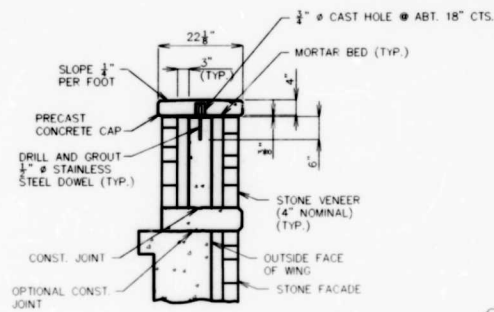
DETAILS OF STONE FACADE ON INTERMEDIATE BENT NO. 2
